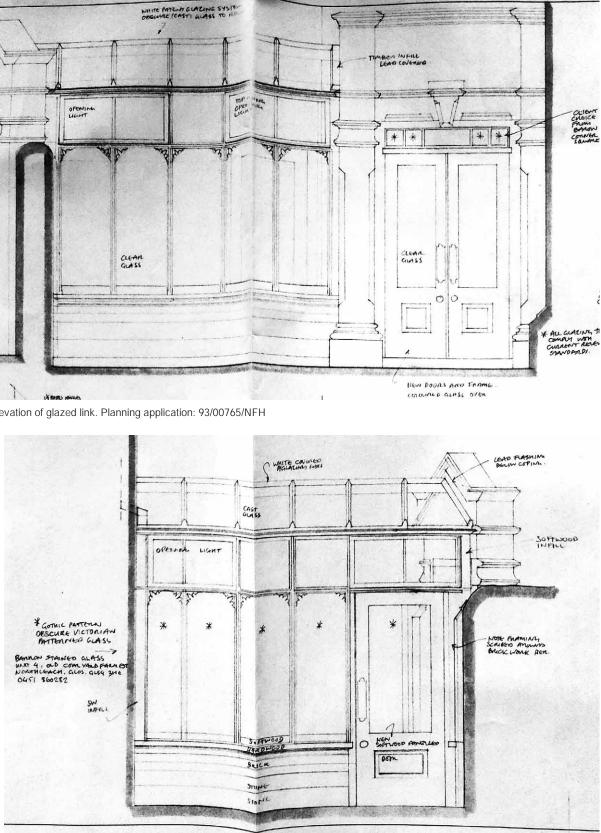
South elevation of glazed link. Planning application: 93/00765/NFH
